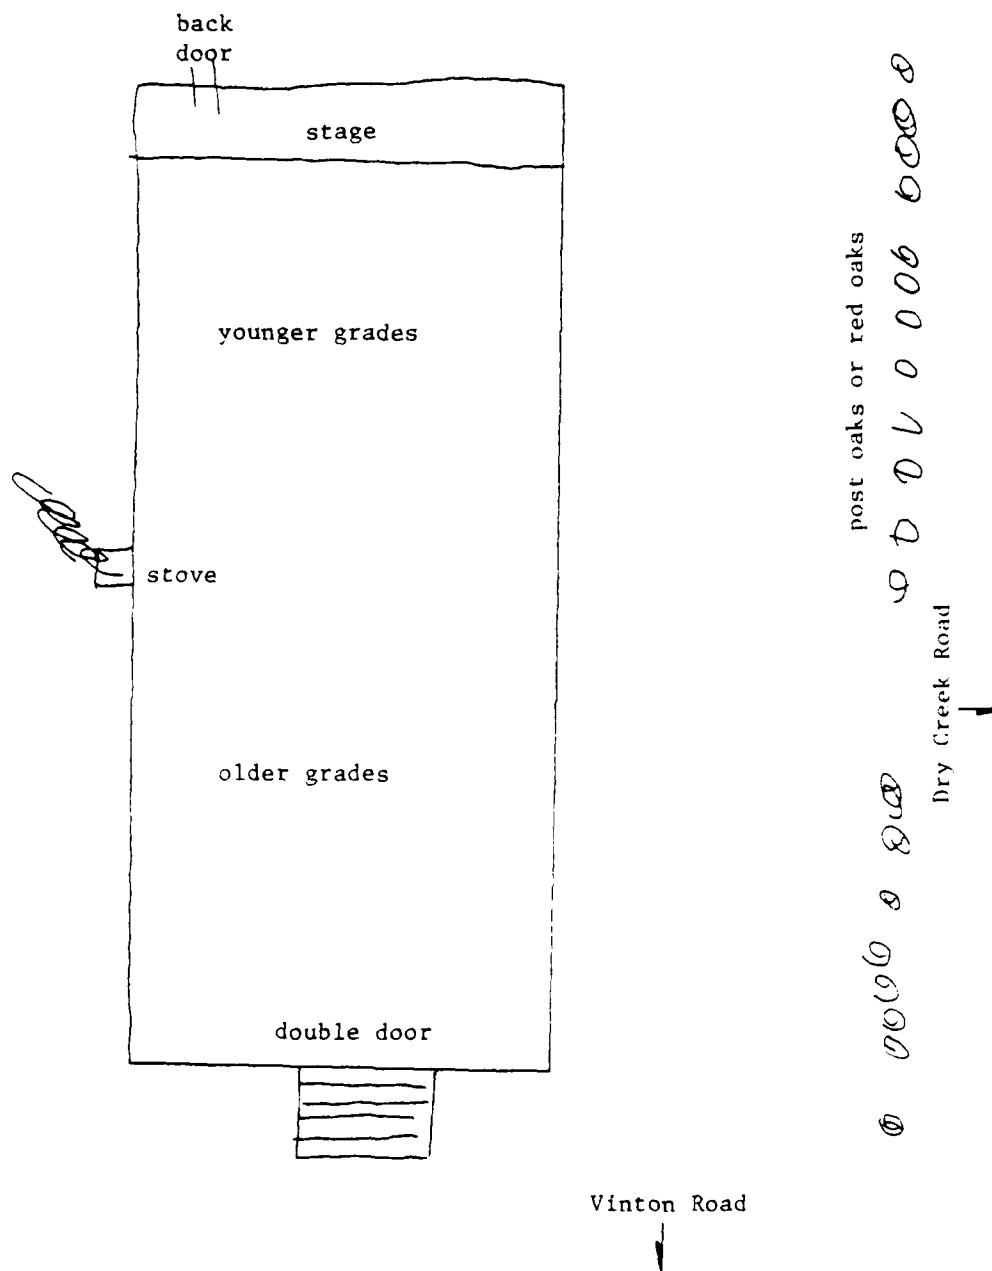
Floor plan of the Vinton School. Drawing by Josie Kennedy.
